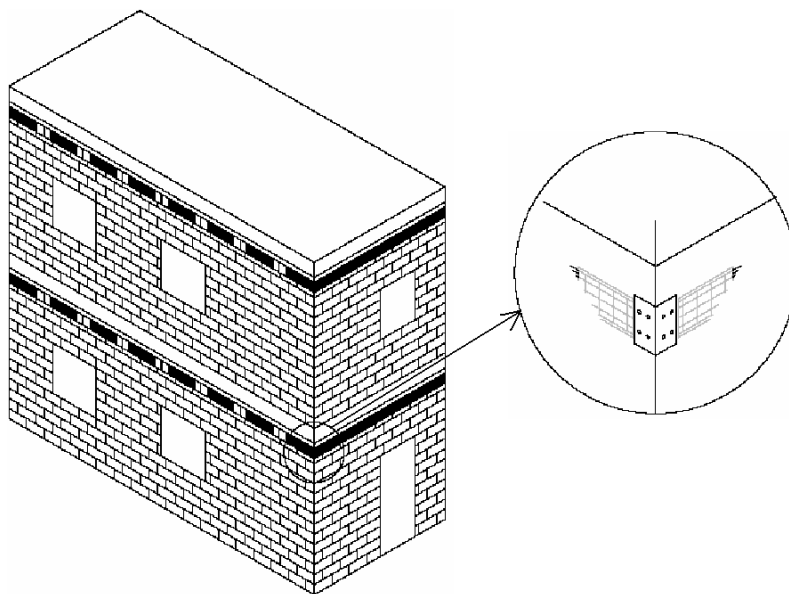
FRP wrapping of a masonry building and detail of the metallic plate to which the device will be connected.
